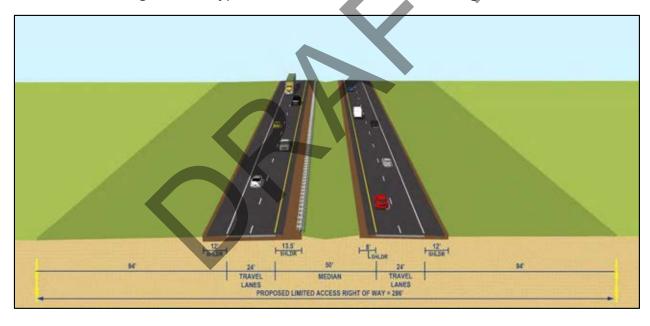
Typical Section – Alternative 2: New Alignment
